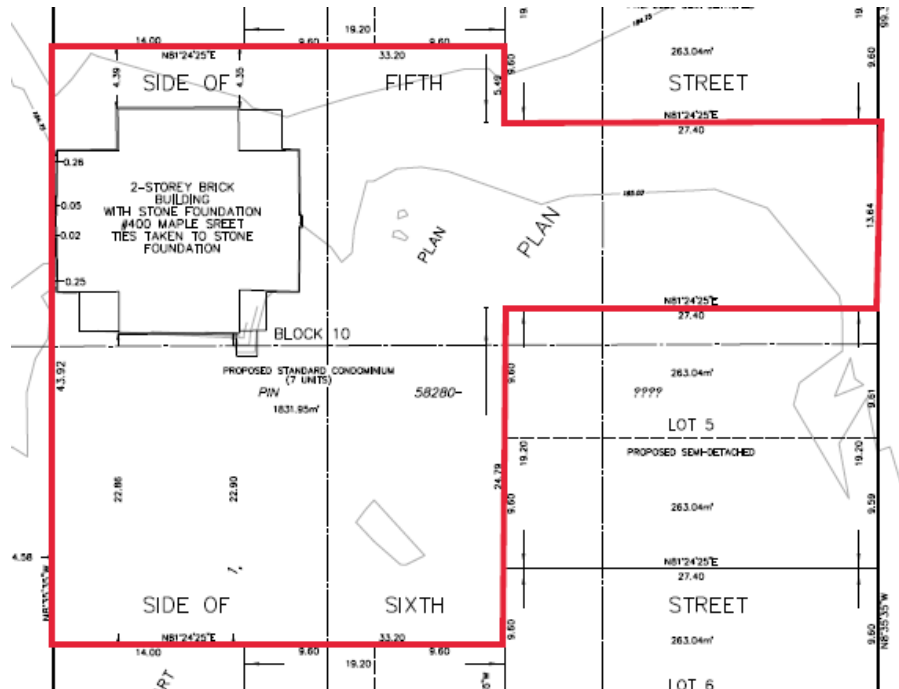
Interior Block Site Plan Boundary (Excerpt, J.D.Barnes)
